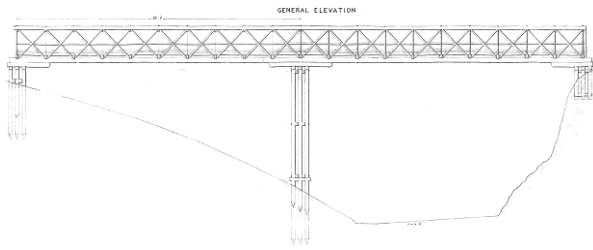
Bennett's Vacy Bridge, 1858 (83' 9")
